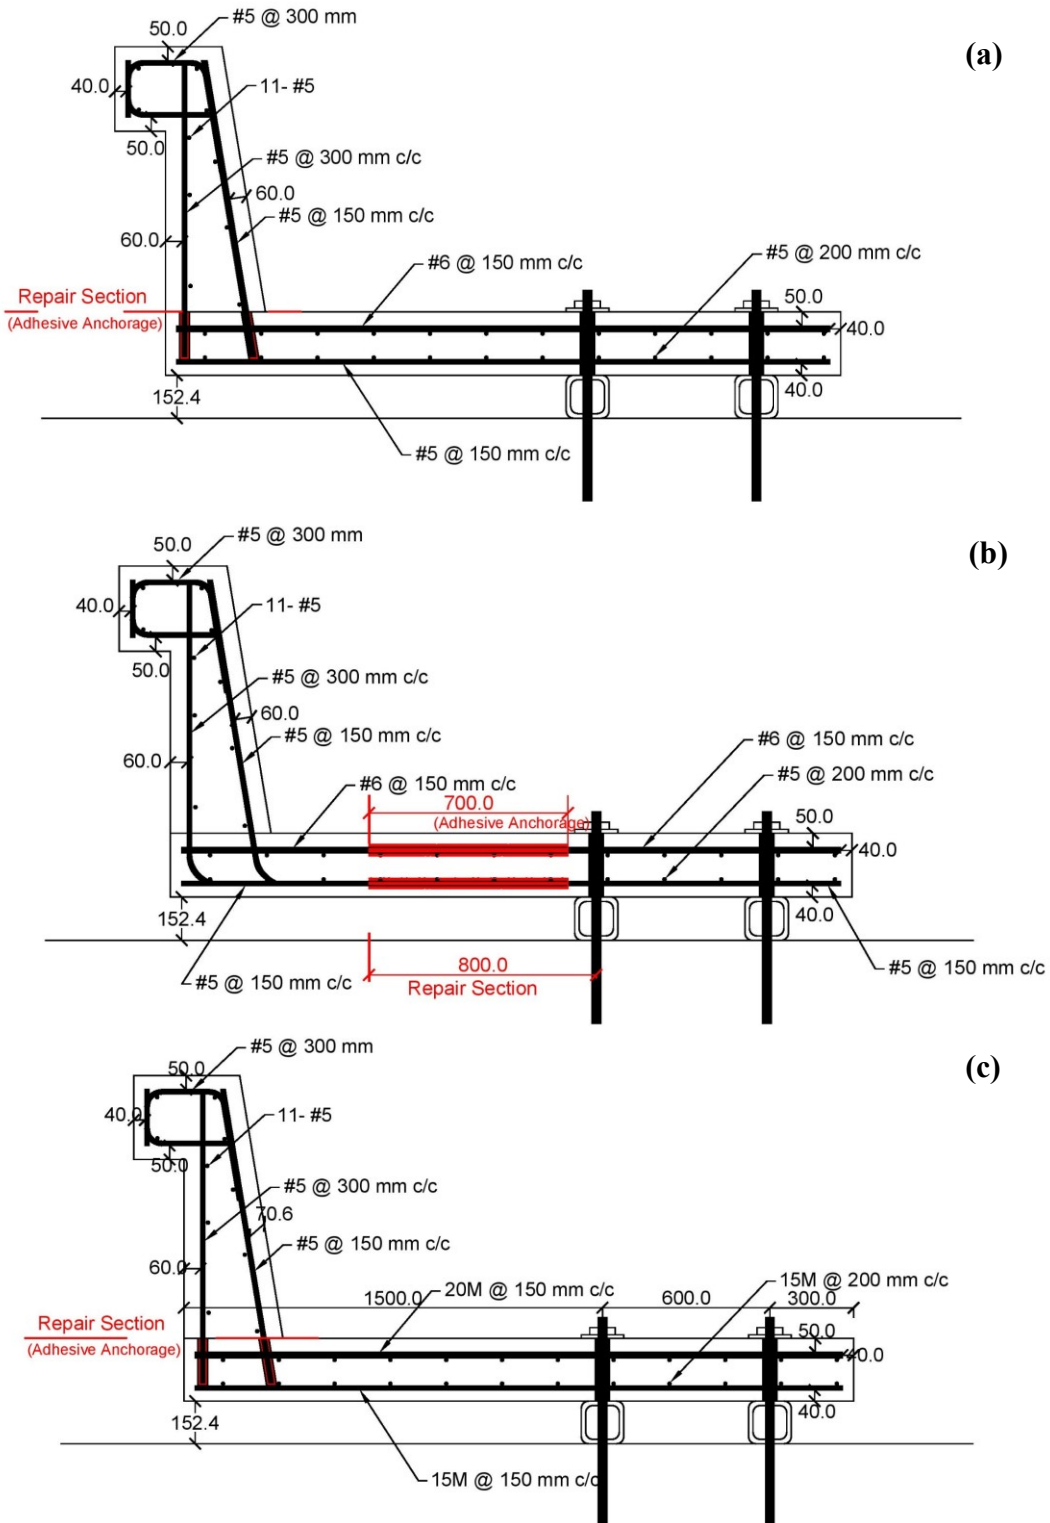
Barrier repair test specimens (a) Specimen RG-P (b) Specimen RG-D (c) Specimen RH-P.
